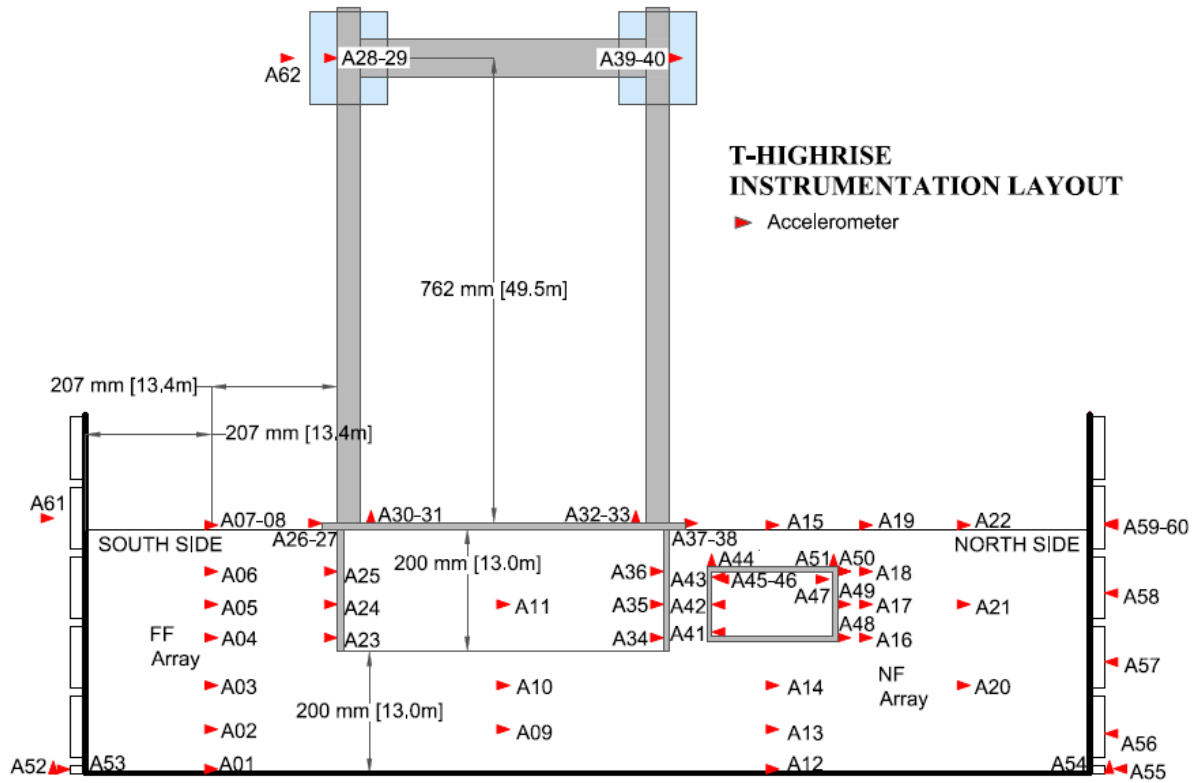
T-Highrise accelerometer layout, elevation view.
